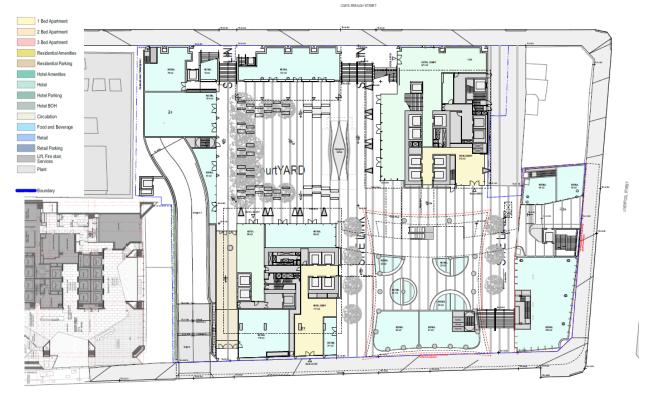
Extract of proposed plans – ground floor plan Source: fjmt studio, 2019
